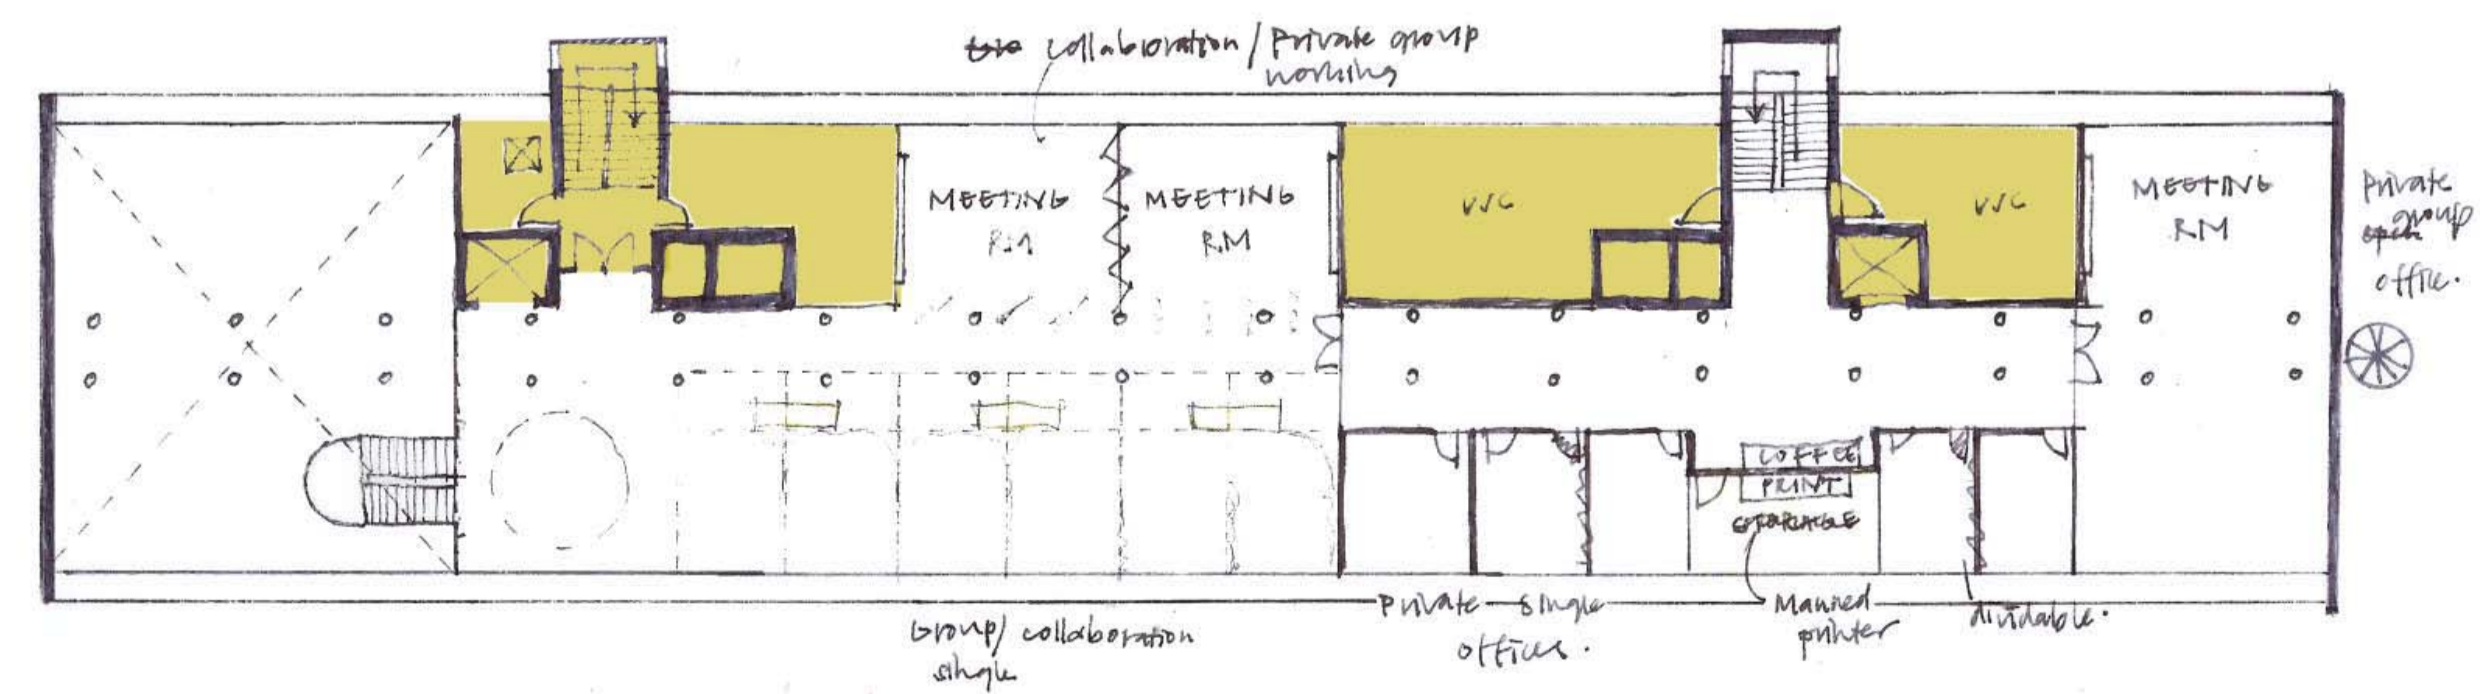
FIRST/ SECOND FLOOR ZONING PLAN
